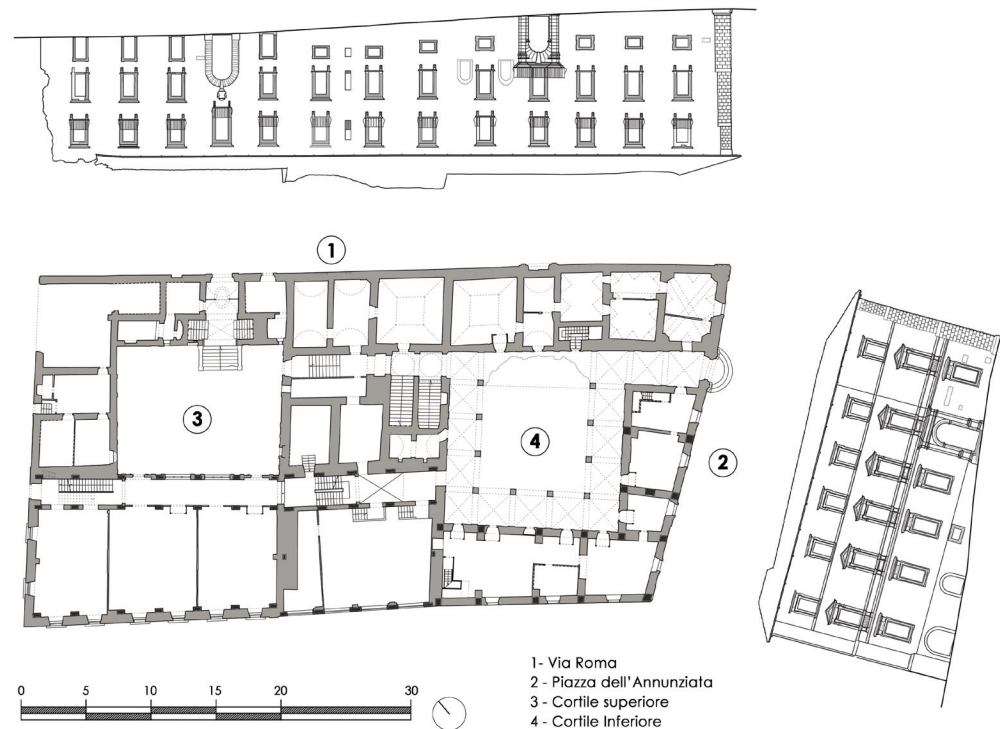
Palazzo Carli in L'Aquila, plan of the ground floor and elevations on Via Roma and Piazza dell'Annunziata (graphic elaboration by the author).
